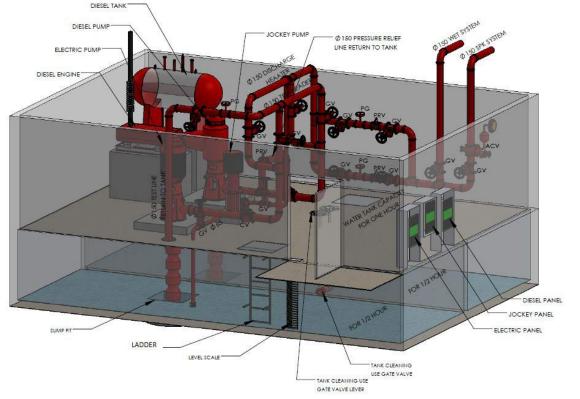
B: Water Tank and Fire Pump Arrangement for Vertical Turbine Pump
